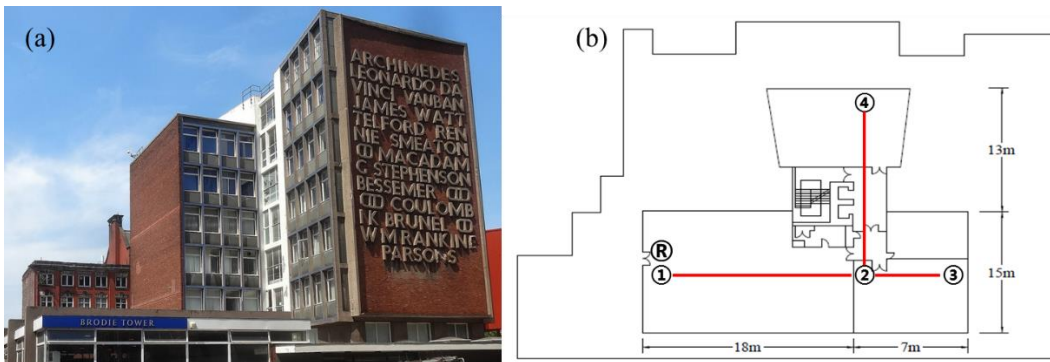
(a) Overview of the Brodie Tower; (b) floor plan and sensor locations.
